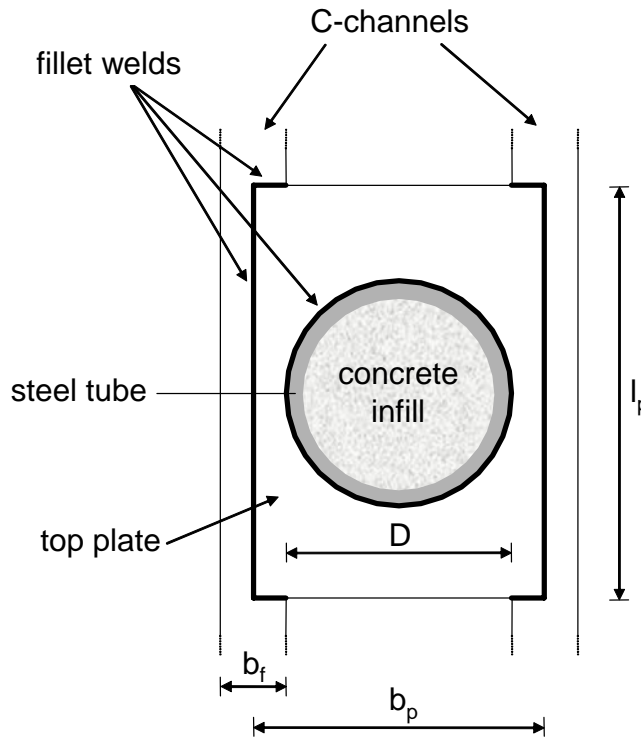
Plan View of Connection between CFST Column and Foundation Beam (for clarity, embedding concrete is not shown)
